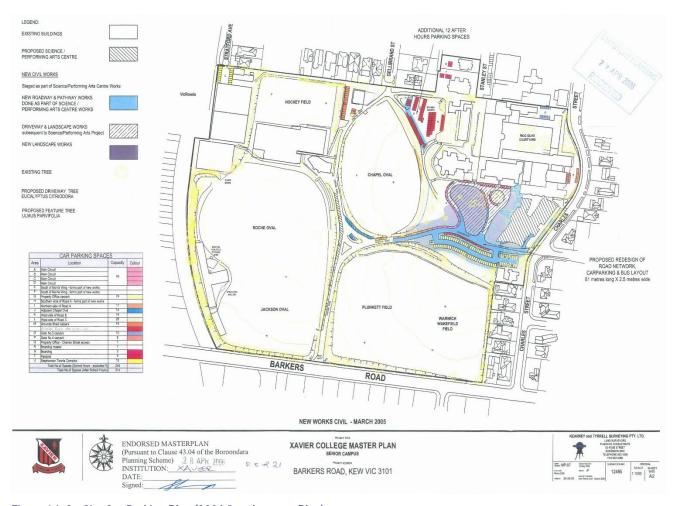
On-Site Car Parking Plan (2006 Development Plan)
